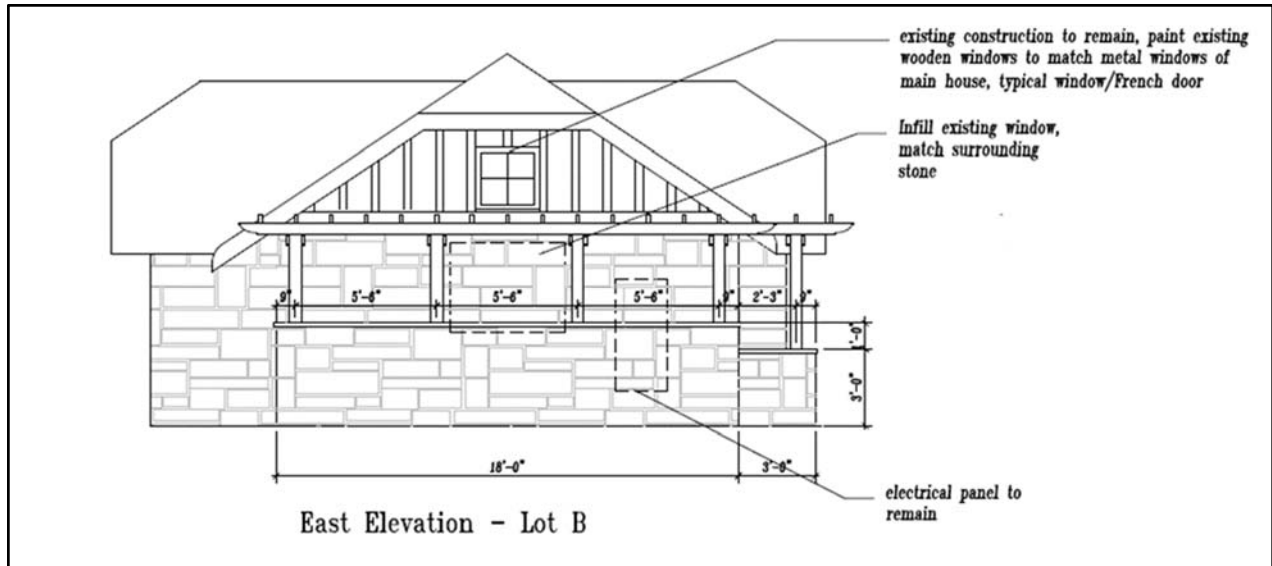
Proposed Architectural Style as Viewed from Isabella Avenue, Lot B
